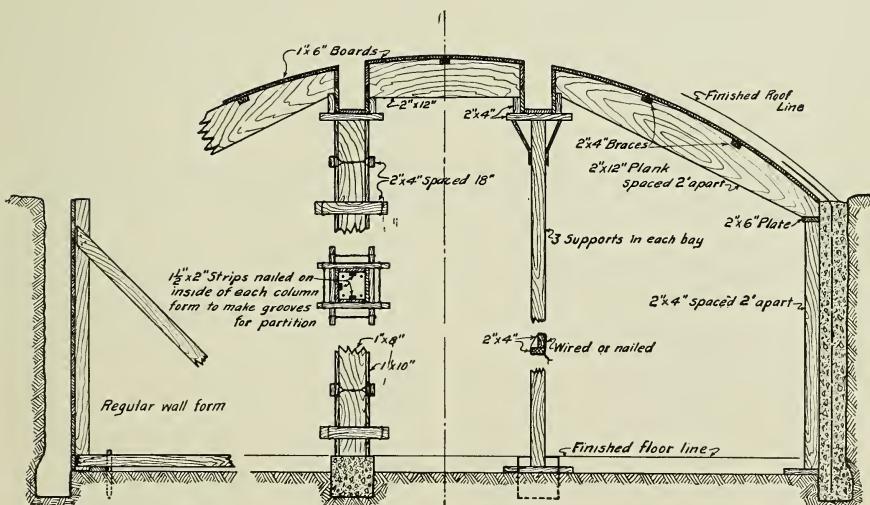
Plan and Elevation of an Arch-Top Root Cellar of Reinforced Concrete Construction. Adapted from a design by Prof. R. M. Dove, of the North Dakota Experiment Station.
